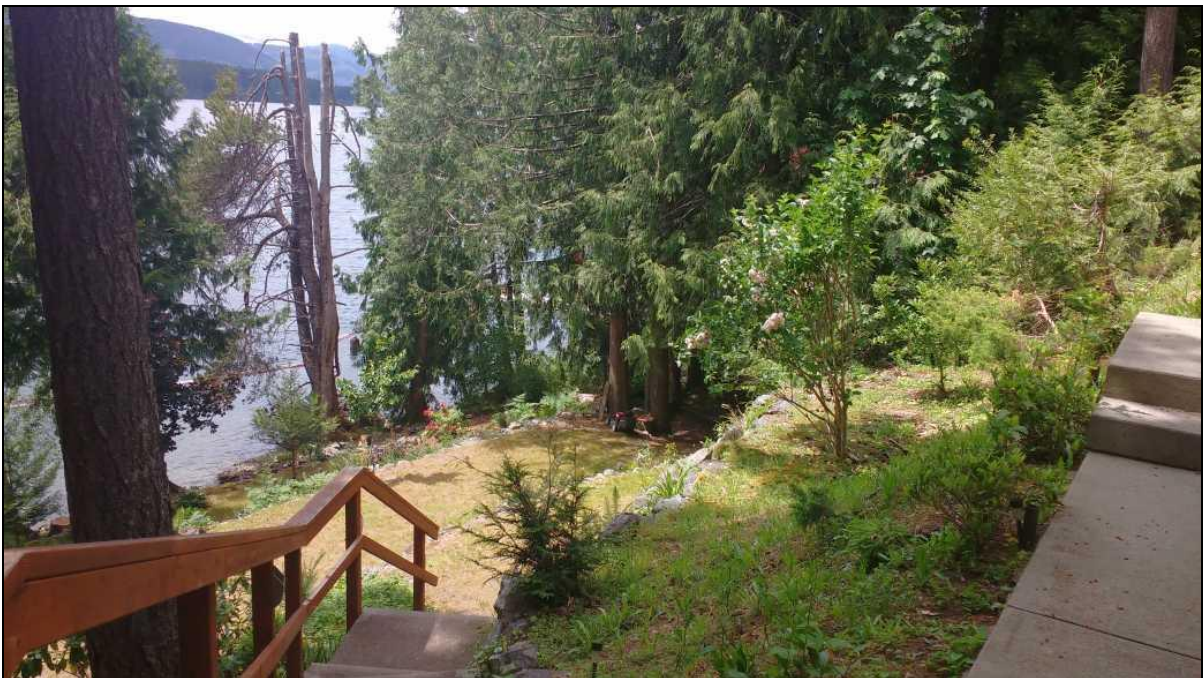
Southwest view from the top of the stairs at the southeast corner of the existing house.
